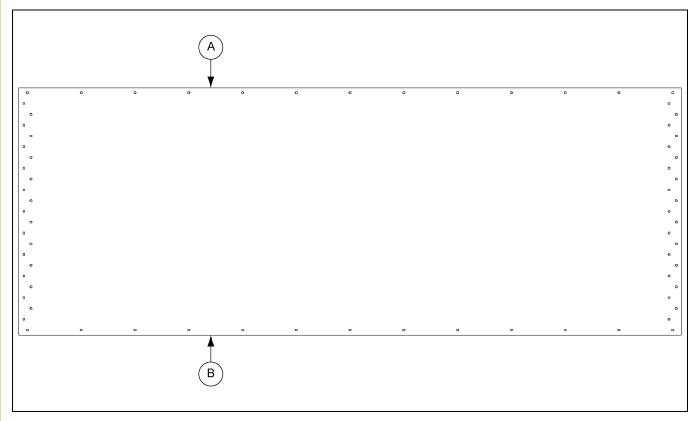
A Top Sidewall Sheet Orientation (Viewed from Outside of the Bin)
